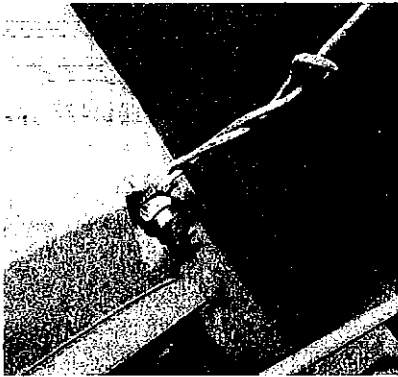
This image shows an improper attachment of a bonding wire to a pump motor at a large competition pool. The bonding wire should be installed with a suitable connector.
